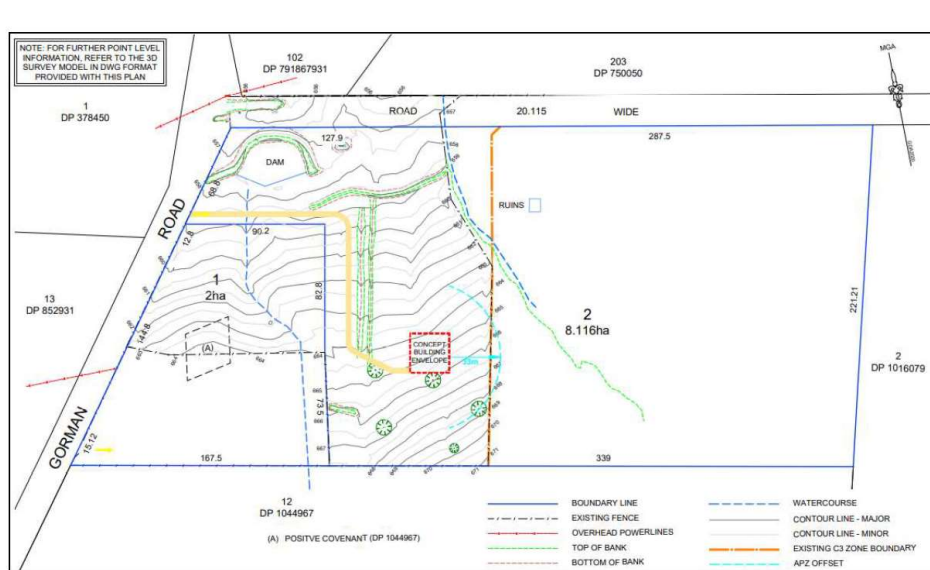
Concept Subdivision Plan (Source: planning proposal document)
